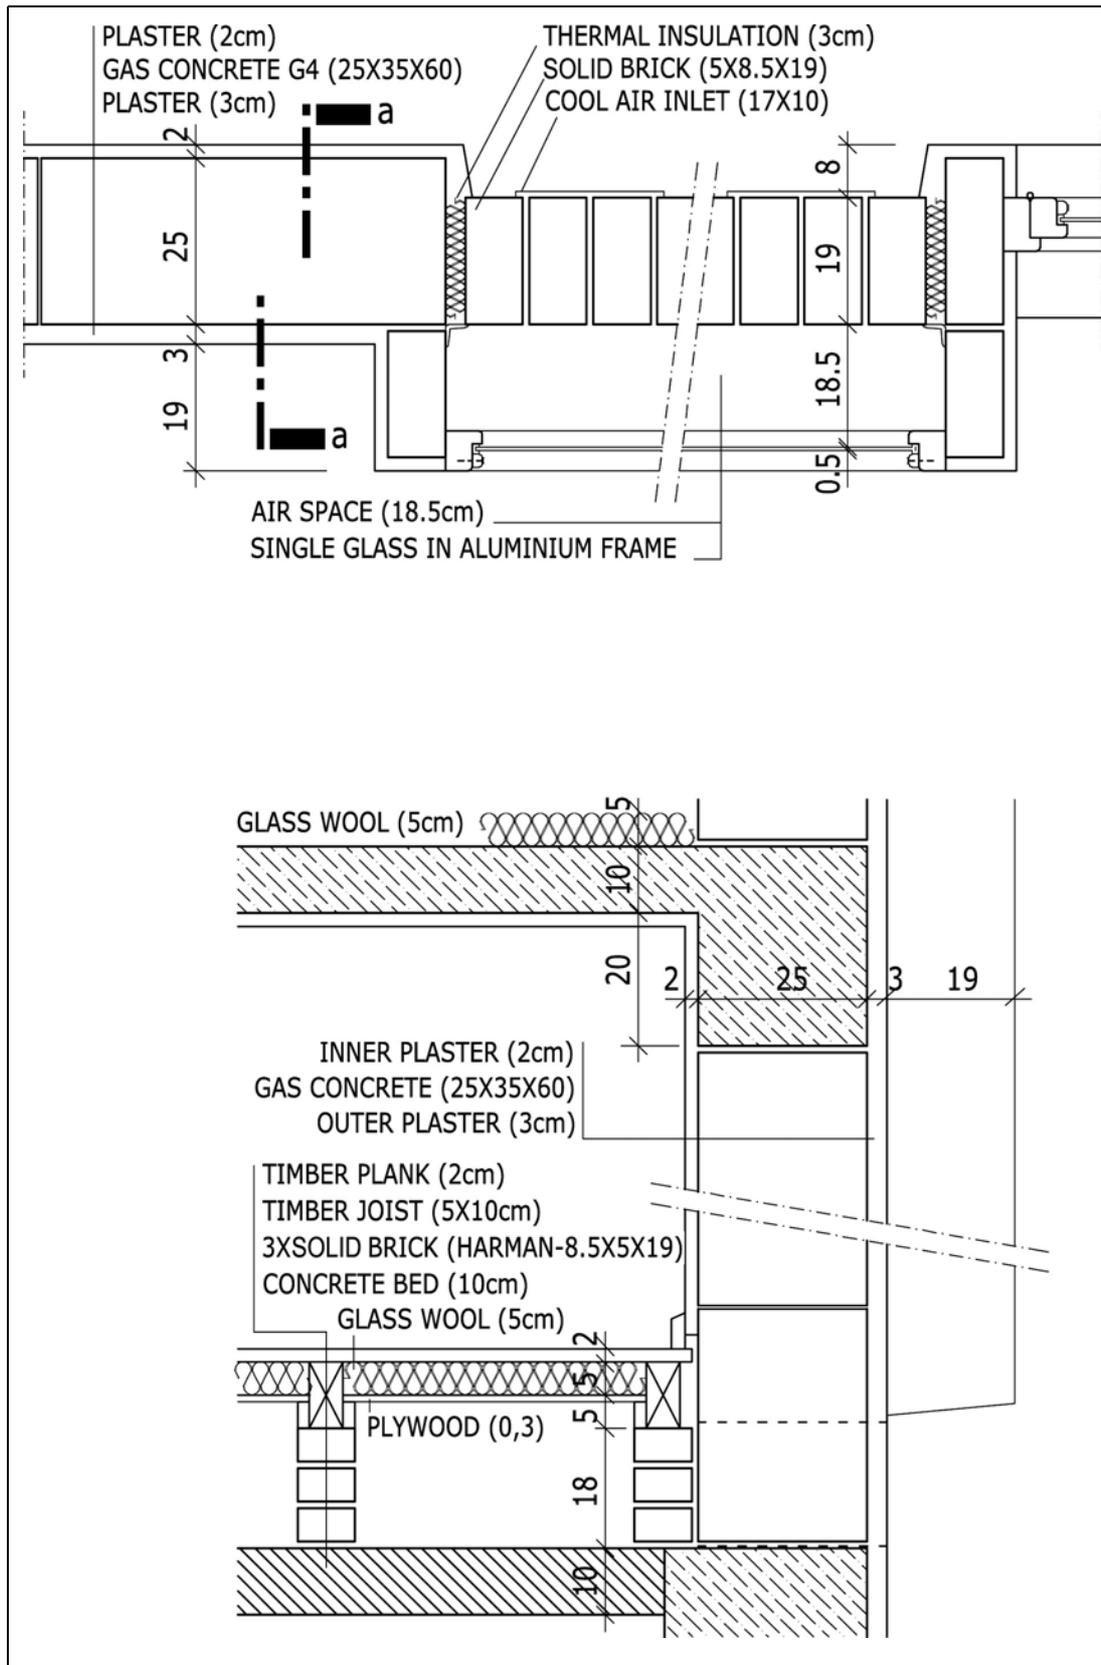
Two details specific to the sample dwelling made of gas concrete: plan of the Trombe Wall and the system section including the suspended ground floor, the roof floor, and the outer wall; Scale 1/10
